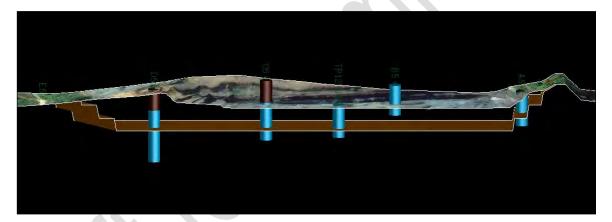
Cross Section Cut through the Pit in a North South Orientation
